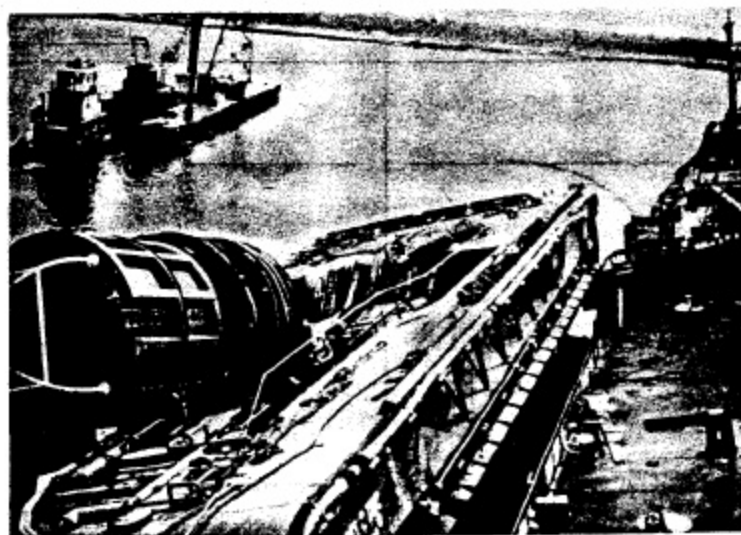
RA-DE SALM fully assembled being loaded aboard tanker by hydraulic ram.
